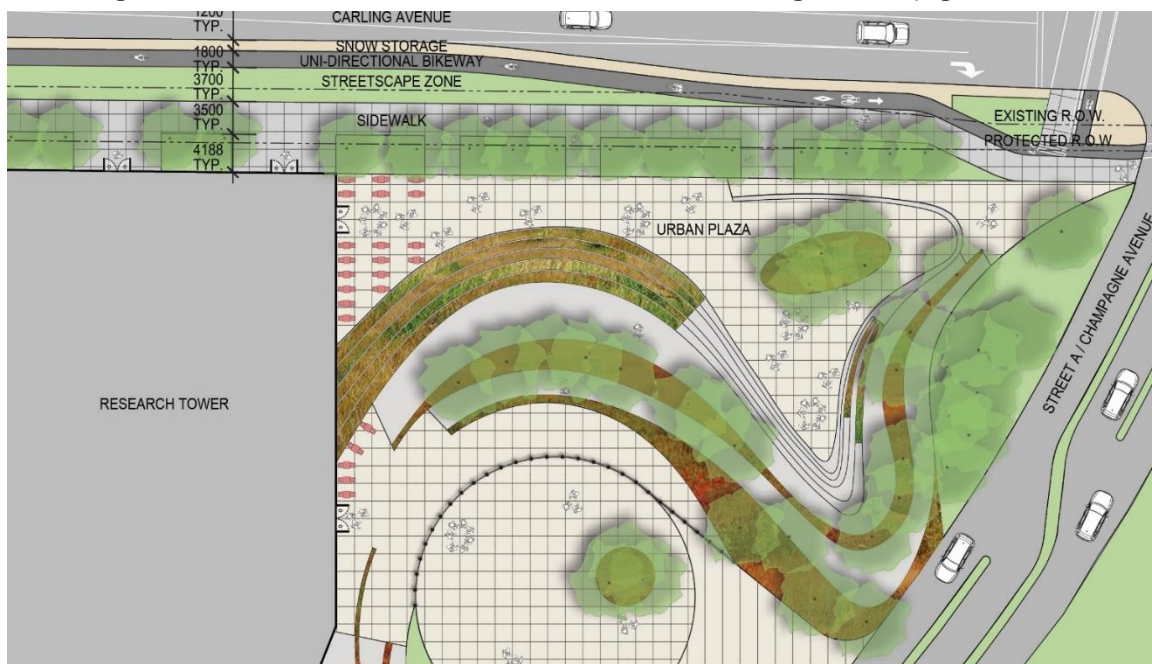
Master Site Plan - Urban Plaza Concept at the Corner of Carling and Champagne Avenues
